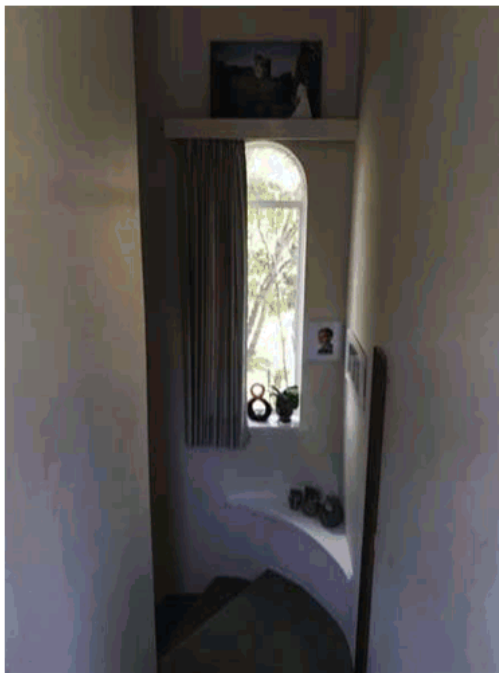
Tall steel framed glazing to maisonette stair with semi-circular operable window at head. (Author photo)
